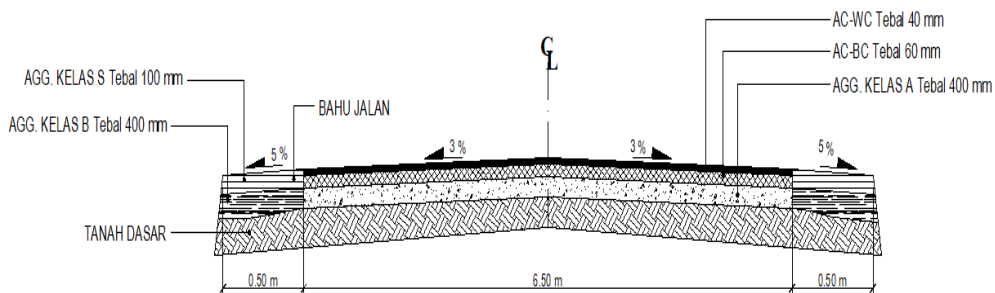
Cross section of the Wassu-Oma road section based on the 2017 MDP
